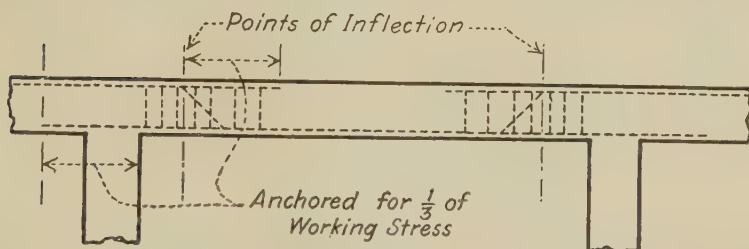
Typical Web Reinforcement for Continuous Beams with Special Anchorages.
